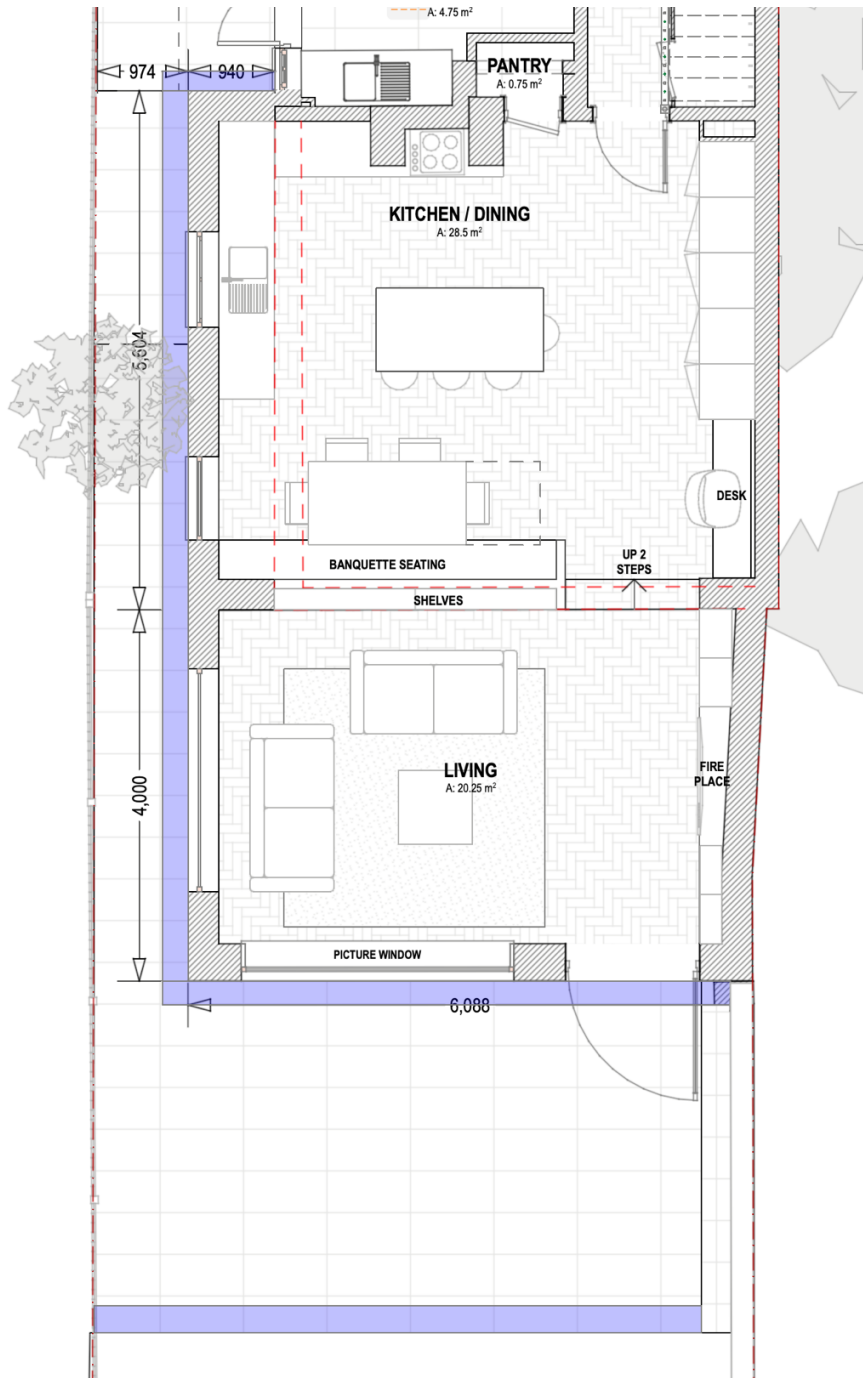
Excerpt from proposed floor plan (NTS) with proposed gulleys/ French drains in blue
